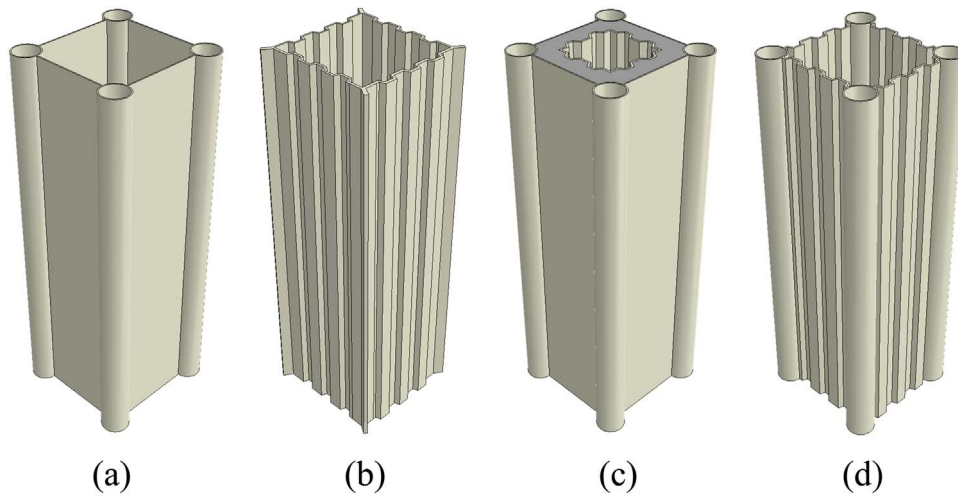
Various types of HFCs (a) Flat face with corner tubes (b) Corrugated face without corner tubes (c) Concrete-filled double skin sections with corner tubes (d) Corrugated face with corner tubes.
